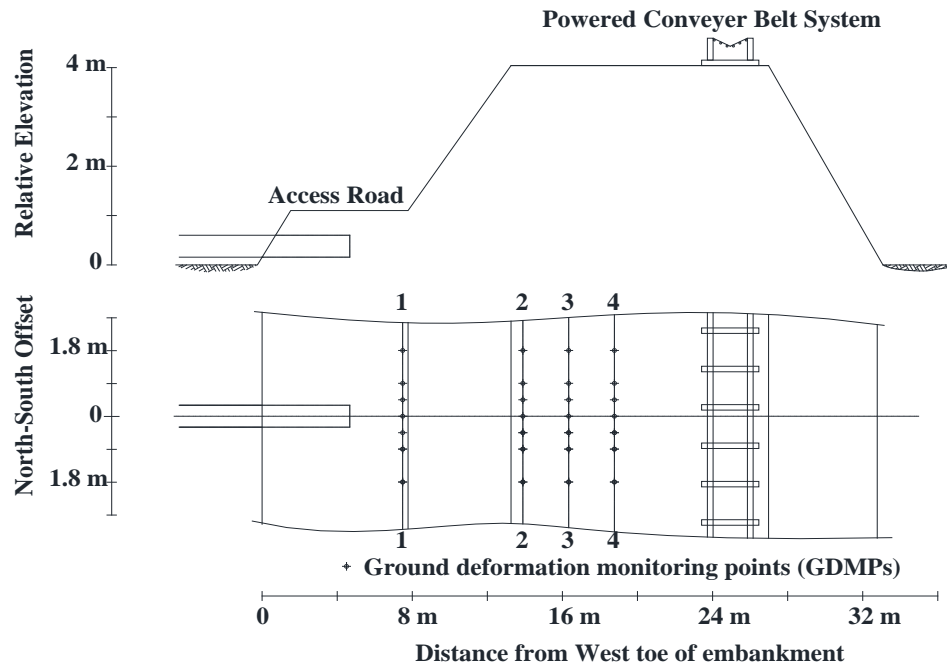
Profile and plan view of the access road and conveyer belt embankment and settlement monitoring points.
